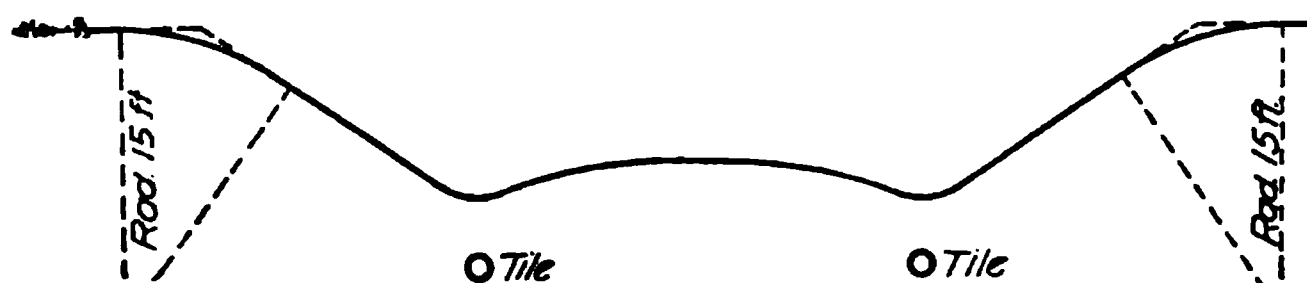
CROSS SECTION FOR EXCAVATION.
